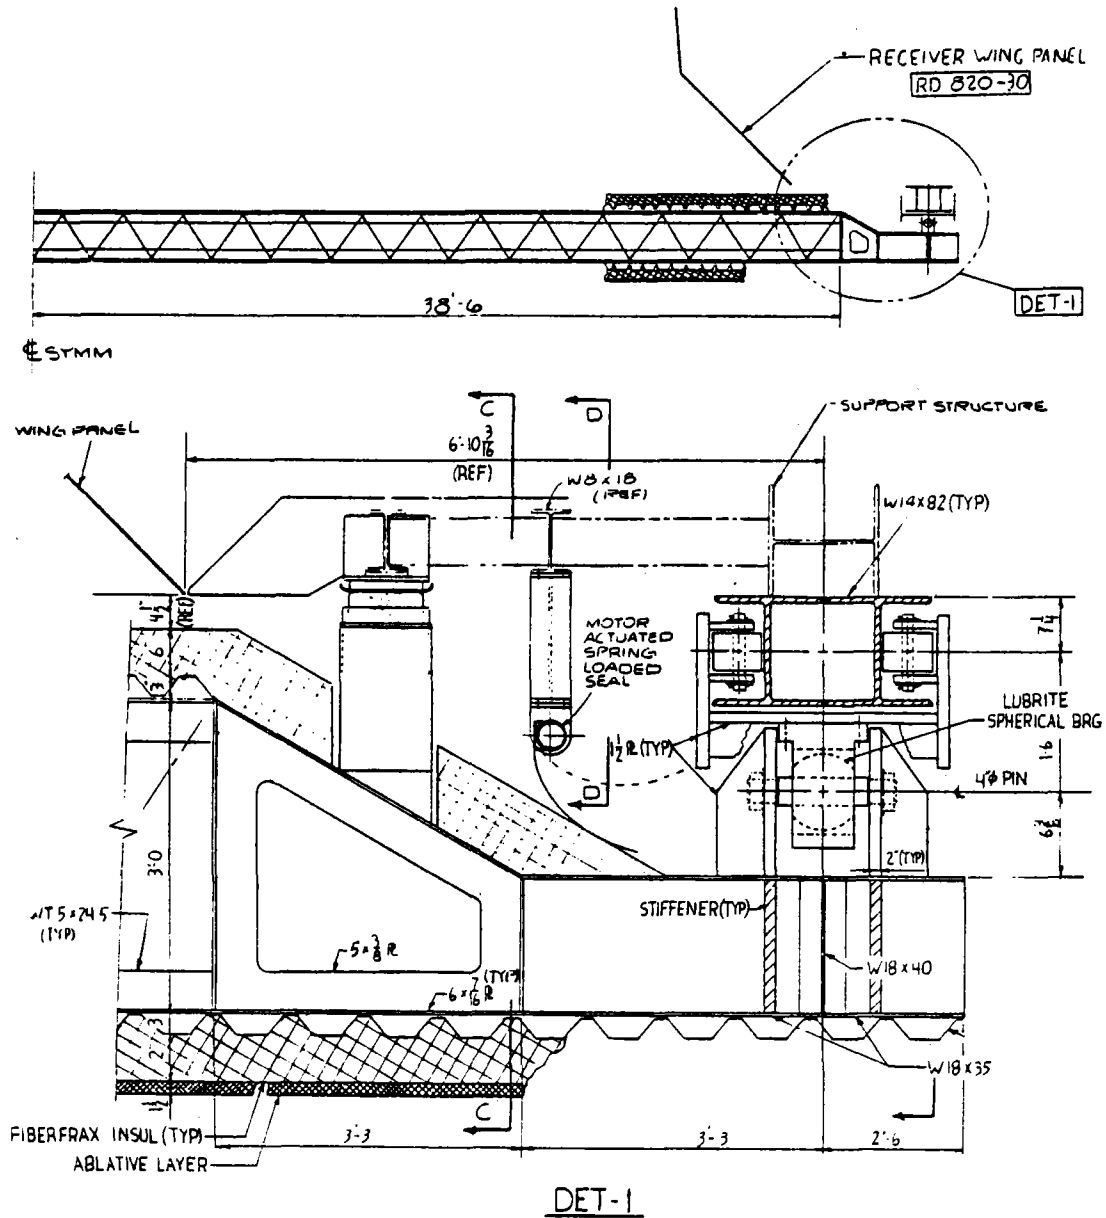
Plan View of Door Edge and Trolley (Right Side)
